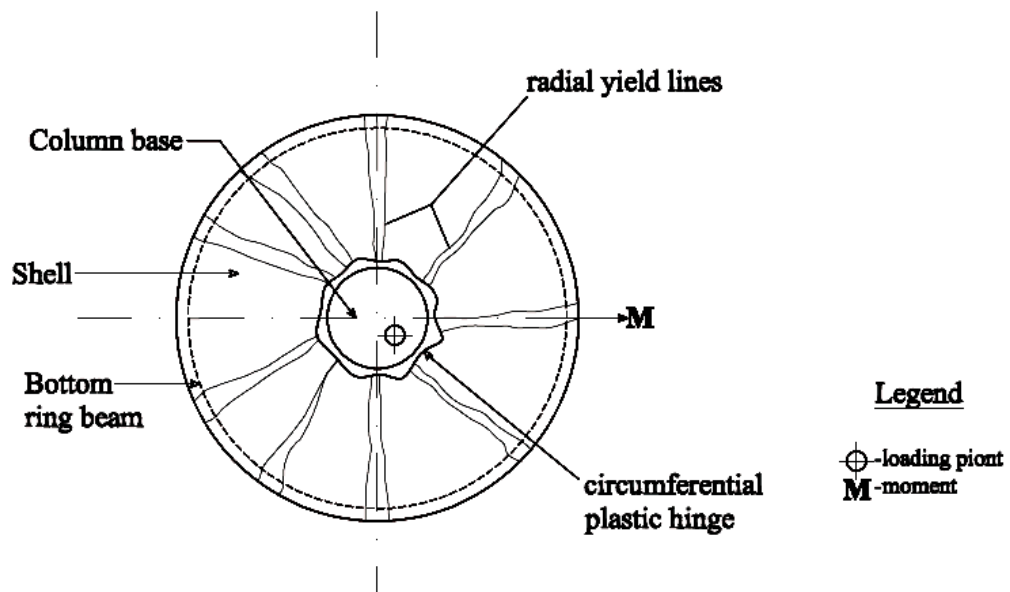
Mode of Failure of Conical Footing Under Eccentric Load (Kurian,2006)
